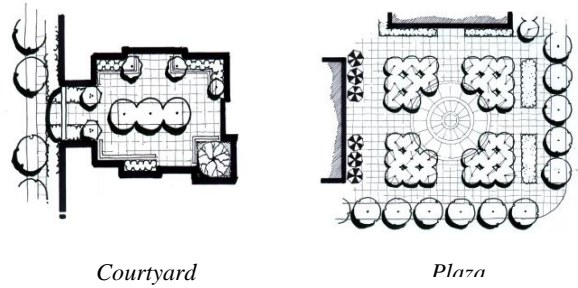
All blocks shall have at least 5% of the block publicly accessible open space such as courtyards or plazas.
